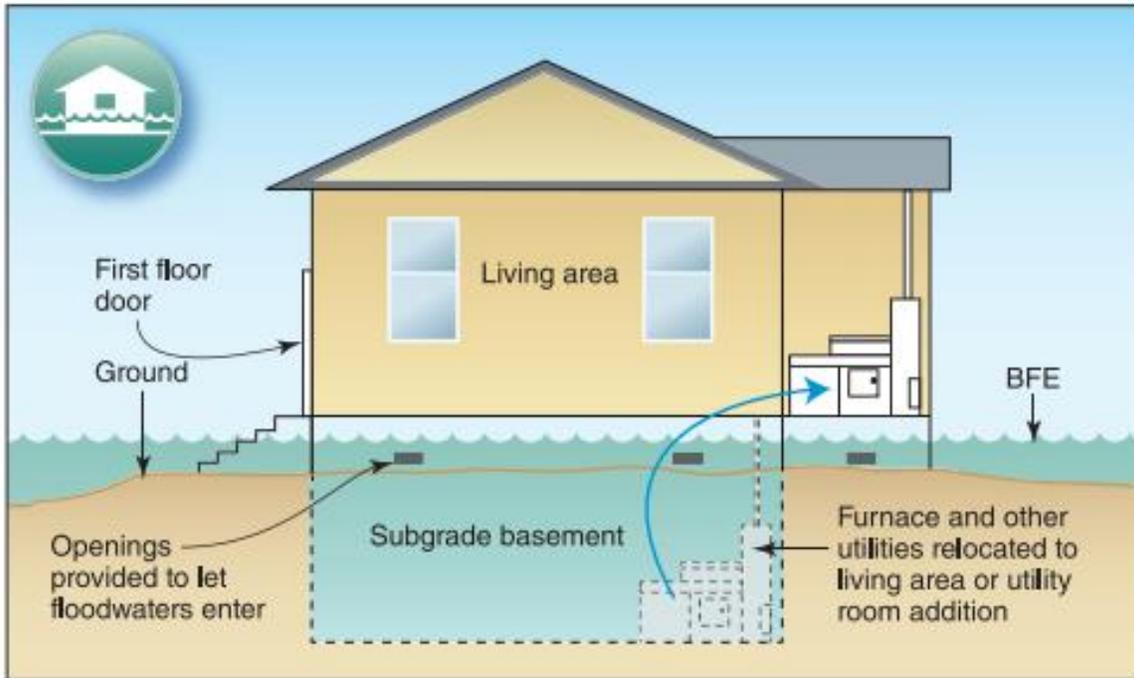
Example of a Home with Wet Floodproofed Subgrade Basement (FEMA 2014)
